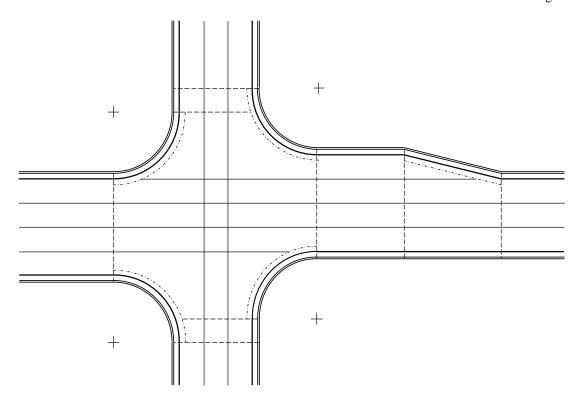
Typical Joint Layout for a Rigid Pavement Intersection (Shows Lane Configuration, Step 3)
